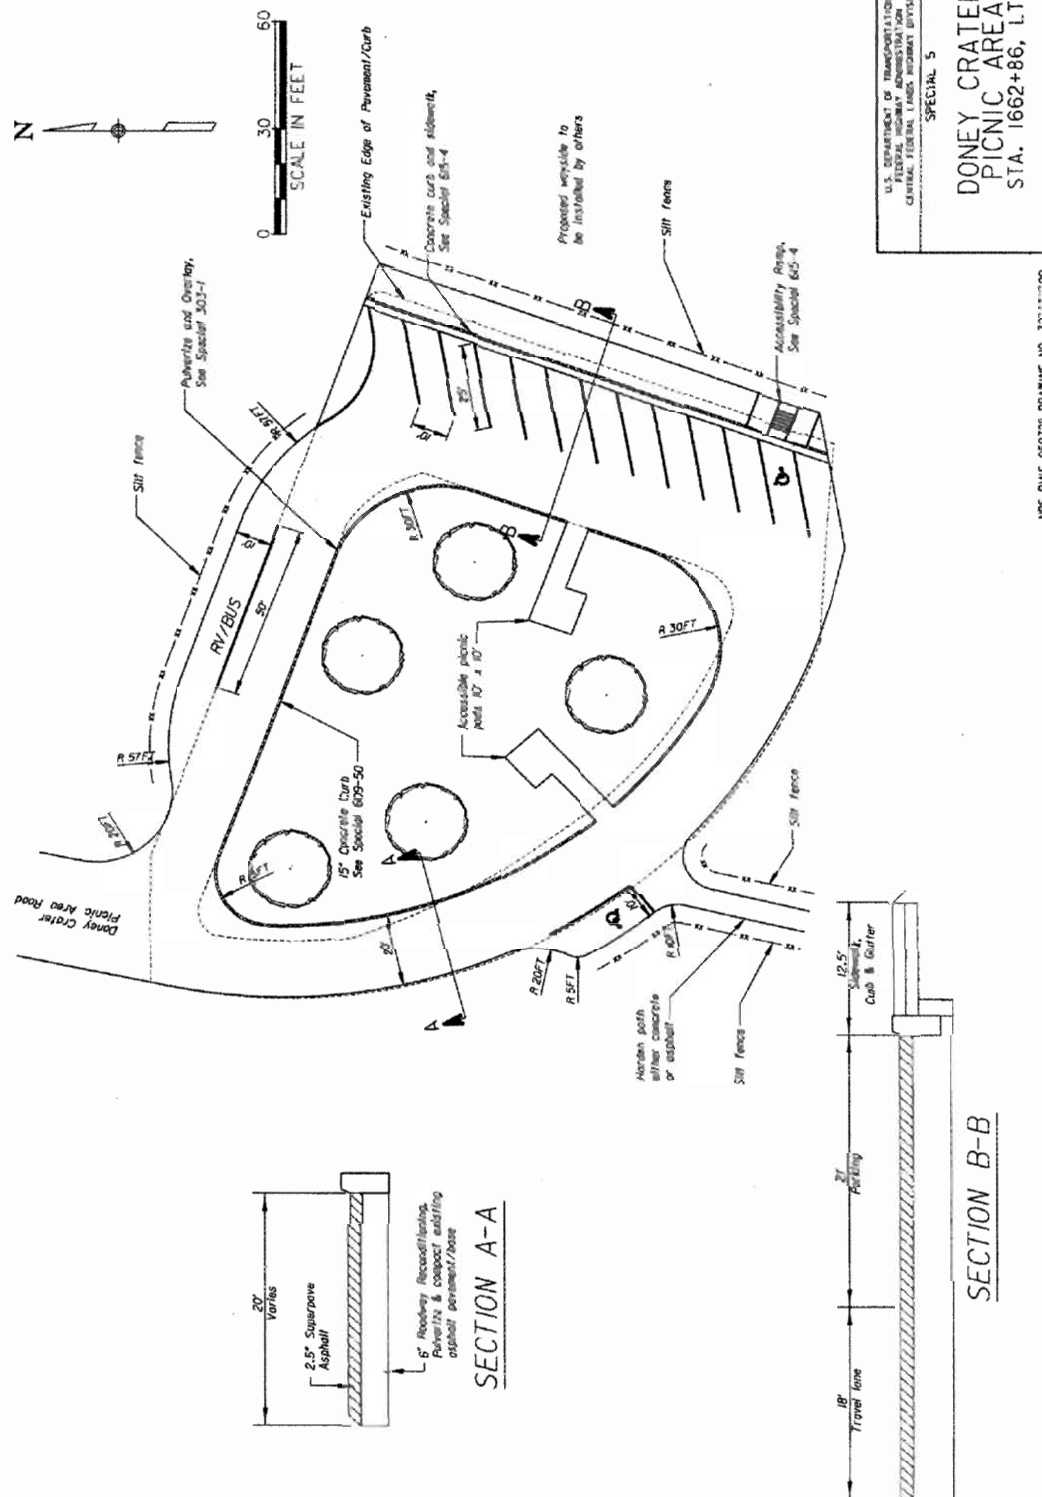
PROPOSED PLANS FOR NEW DONEY CRATER PICNIC AREA [NPS-DSC 322/20024]
